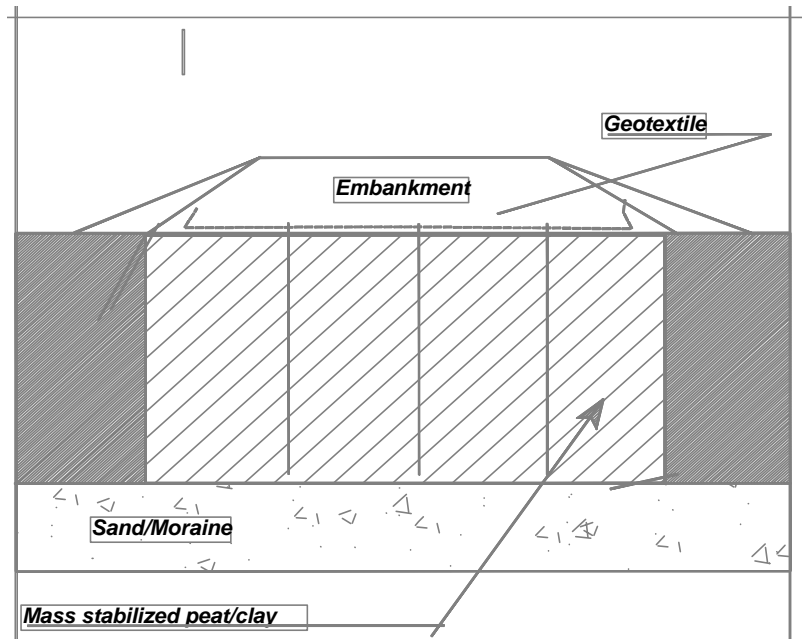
Typical cross-section of mass stabilisation for an embankment.
